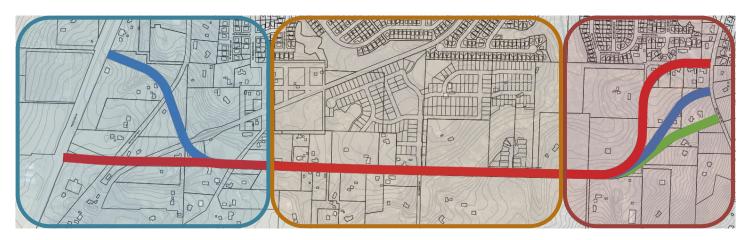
Brookman Concept Plan Subareas and Alignment Options Considered
